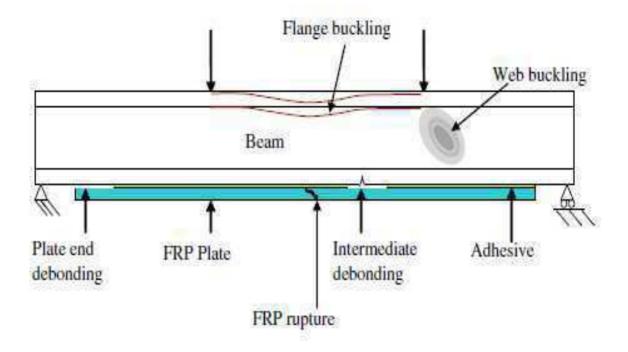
Different Failure Modes of Strengthened Steel Beams [32]
